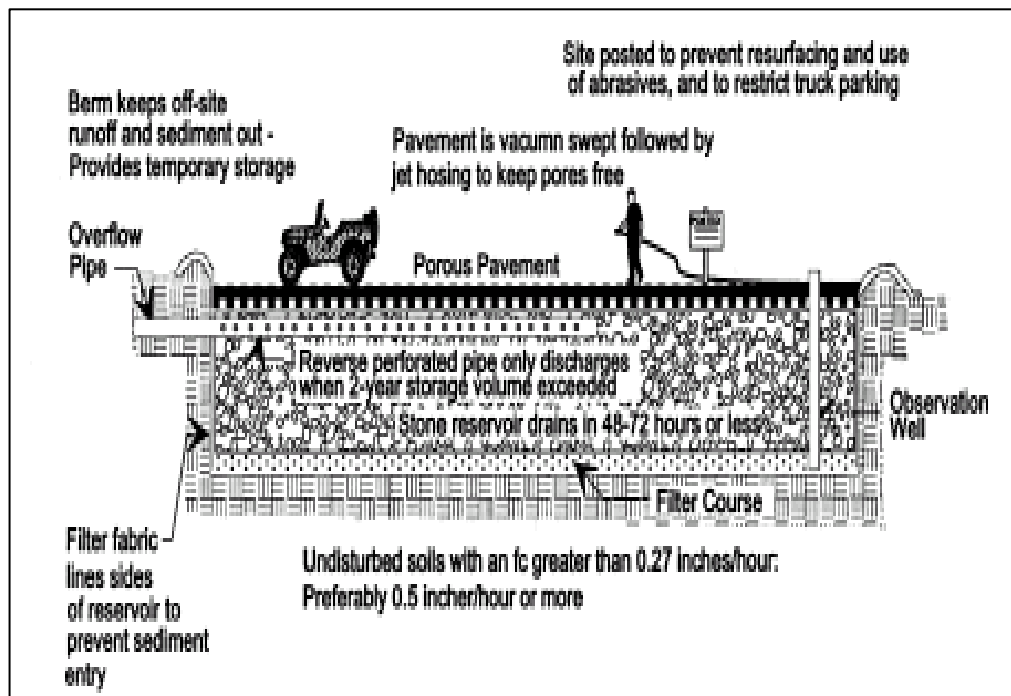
Typical Section of Porous Pavement with Buried Stone Reservoir
